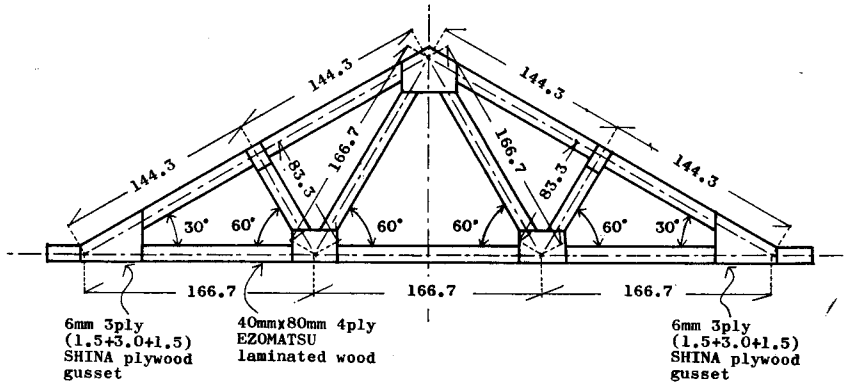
Full scale wooden fink truss joined with glued plywood gussets (Trusses 13 to 18). (unit: cm)
